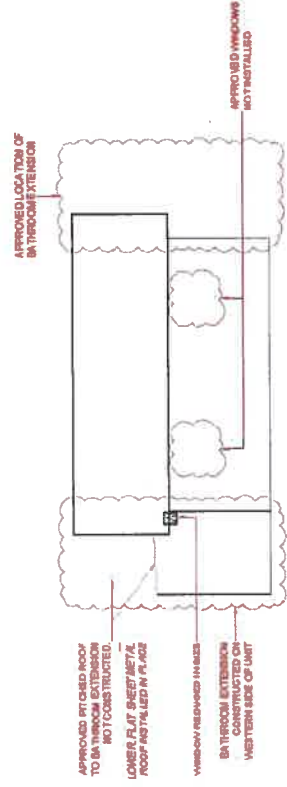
UNIT 2 & UNIT 3 - NORTH ELEVATION (UNIT 1 SHOWN)
